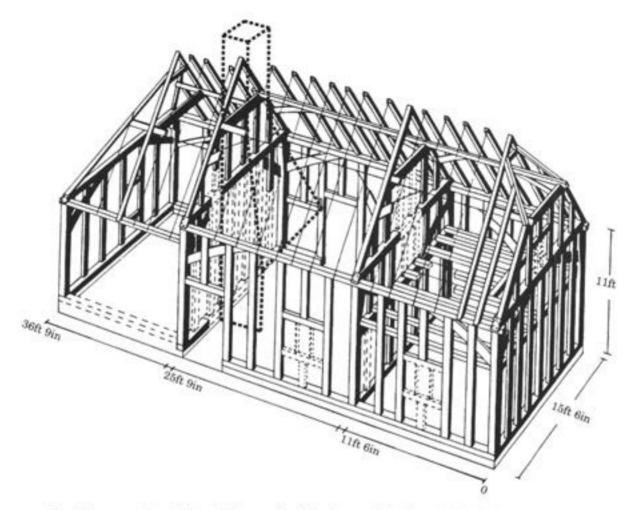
Reconstruction of Wynter's Cottage, Magdalen Laver, with outline of timber chimney.
